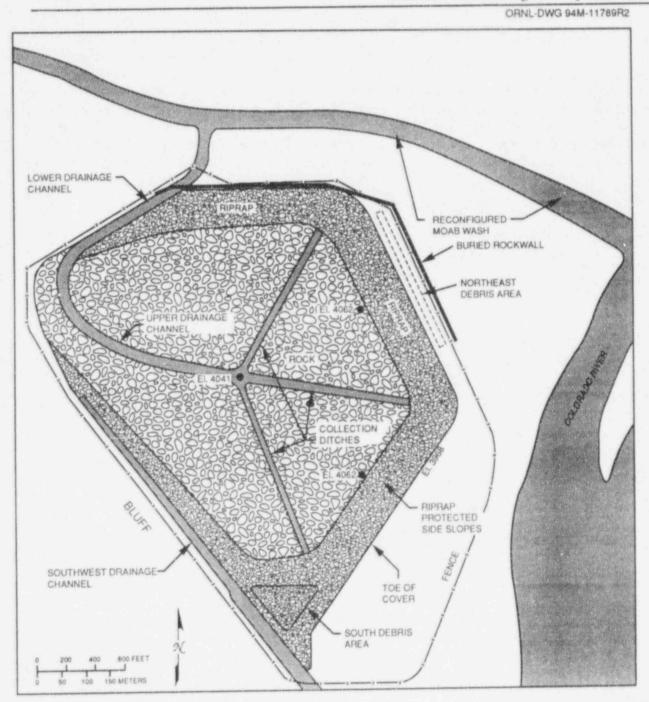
Proposed Surface Structure and Drainage for the Reclaimed Tailings Pile. El. = elevation in ft (divide by 3.281 to obtain meters). Source: Atlas (June 1992). The reclaimed pile would be designed to minimize erosion, infiltration of rain water into the tailings, and the release of radon gas. The pile would be designed to withstand the probable maximum precipitation event and the probable maximum flood (PMF) event. Rock for riprap would have acceptable durability to withstand the forces of weathering. The design would comply with Criterion 6 of 10 CFR Part 40, Appendix A, which states that the design must provide reasonable assurance of control of radiological hazards to be effective for 1000 years to the extent reasonably achievable and, in any case, for 200 years. The layers of the reclaimed pile, from the bottom upward, would include the tailings layer and a cover system (Table 2.1-1 and Figure 2.1-3).
